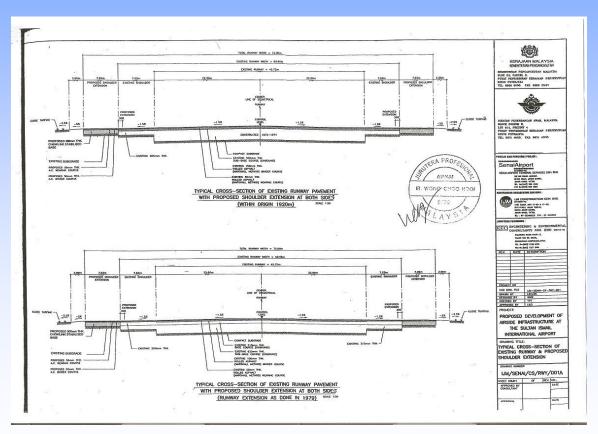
Cross Section of Existing Runway Shoulders vs. Widened Section by Chemical Stabilization
